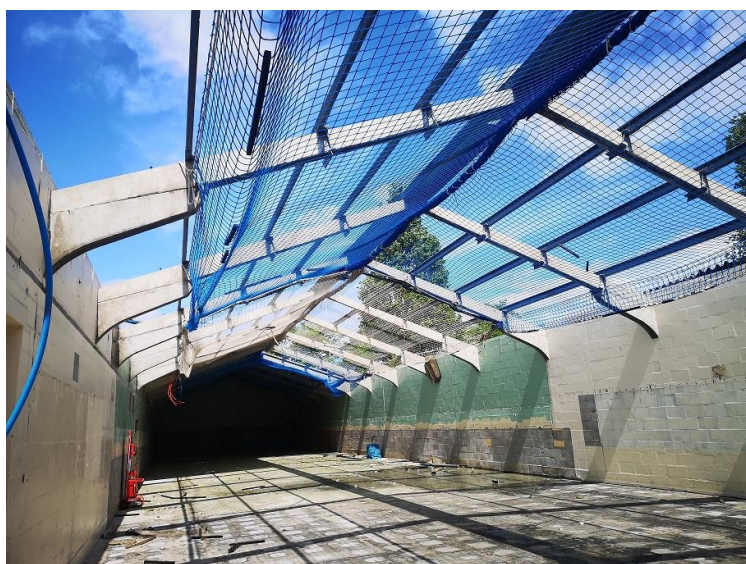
Internal fittings, walls and flooring removed, roof safety netting being installed and roof removal ongoing. 12 May 2022
